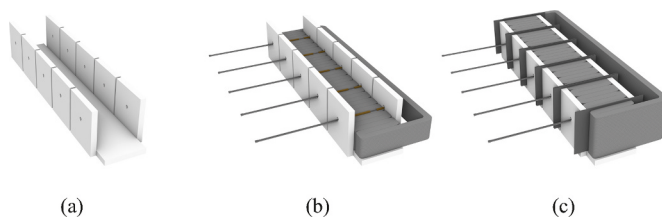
Specimen preparation with reinforcing bars: (a) placement of the formwork; (b) printing of the first 100 mm and placement of the reinforcing bars; (c) printing of the remaining 100 mm and cutting of the specimens.
